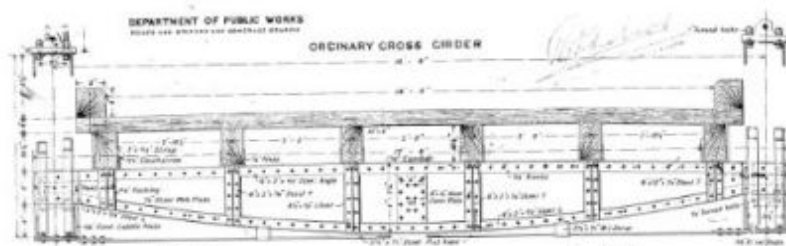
Swan Hill Bridge lift span ‘fish bellied’ member cross sections
